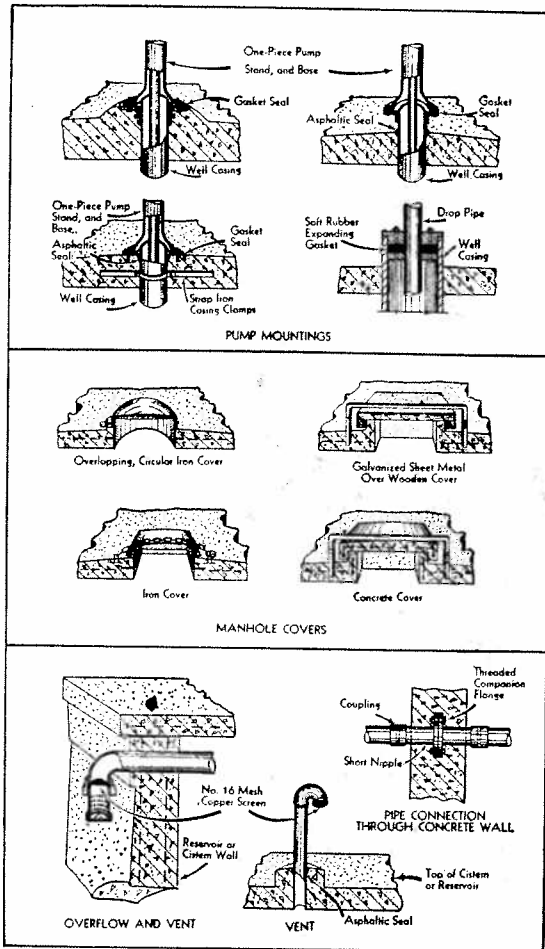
Typical pump mountings, manhole covers, and piping installations.
